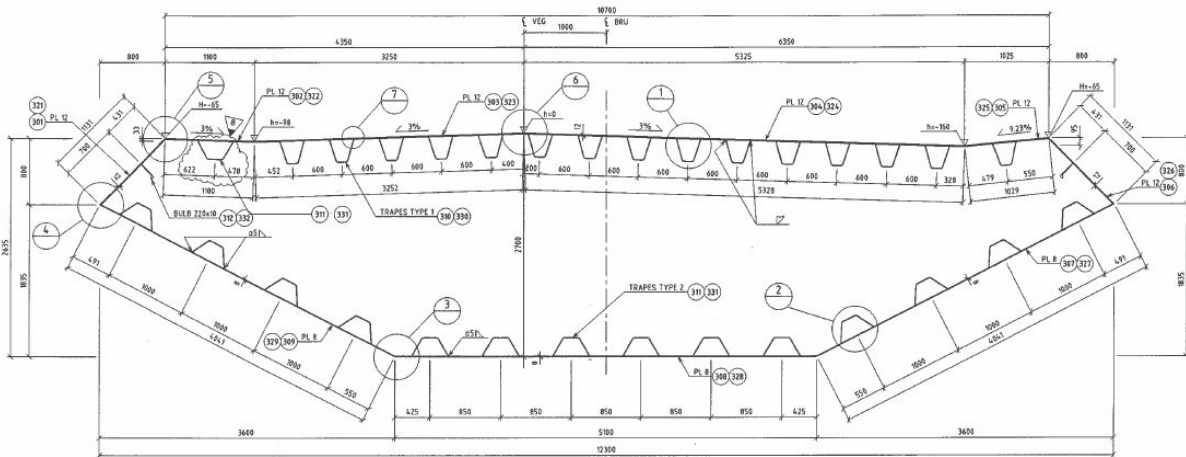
The cross section of the bridge girder in Lysefjord Bridge [7]
